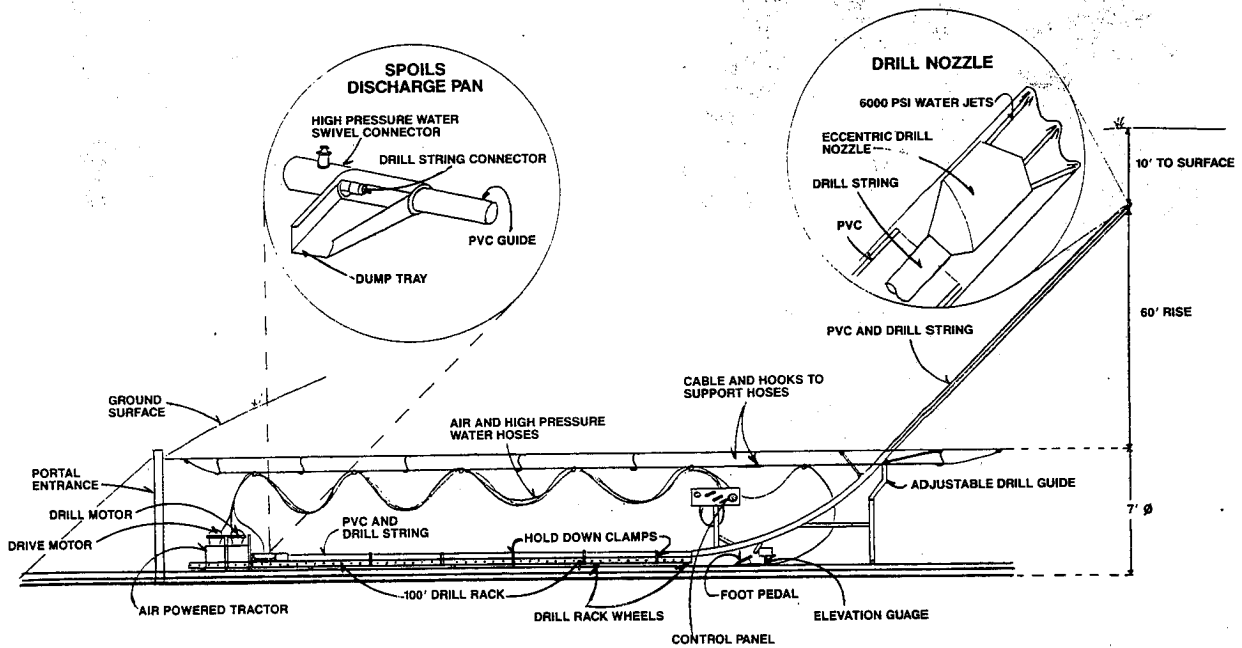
SCHEMATIC DIAGRAM OF WATER JET DRILL IN TUNNEL
